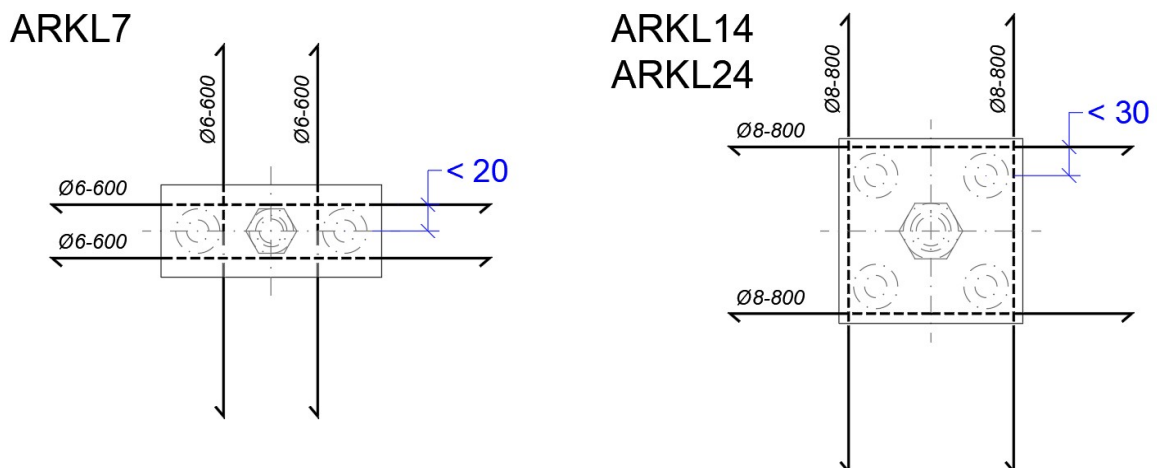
Minimum reinforcement ($f_{yk} \geq 500$ MPa) around stud anchors, the distance to stud anchor must not be exceeded.
